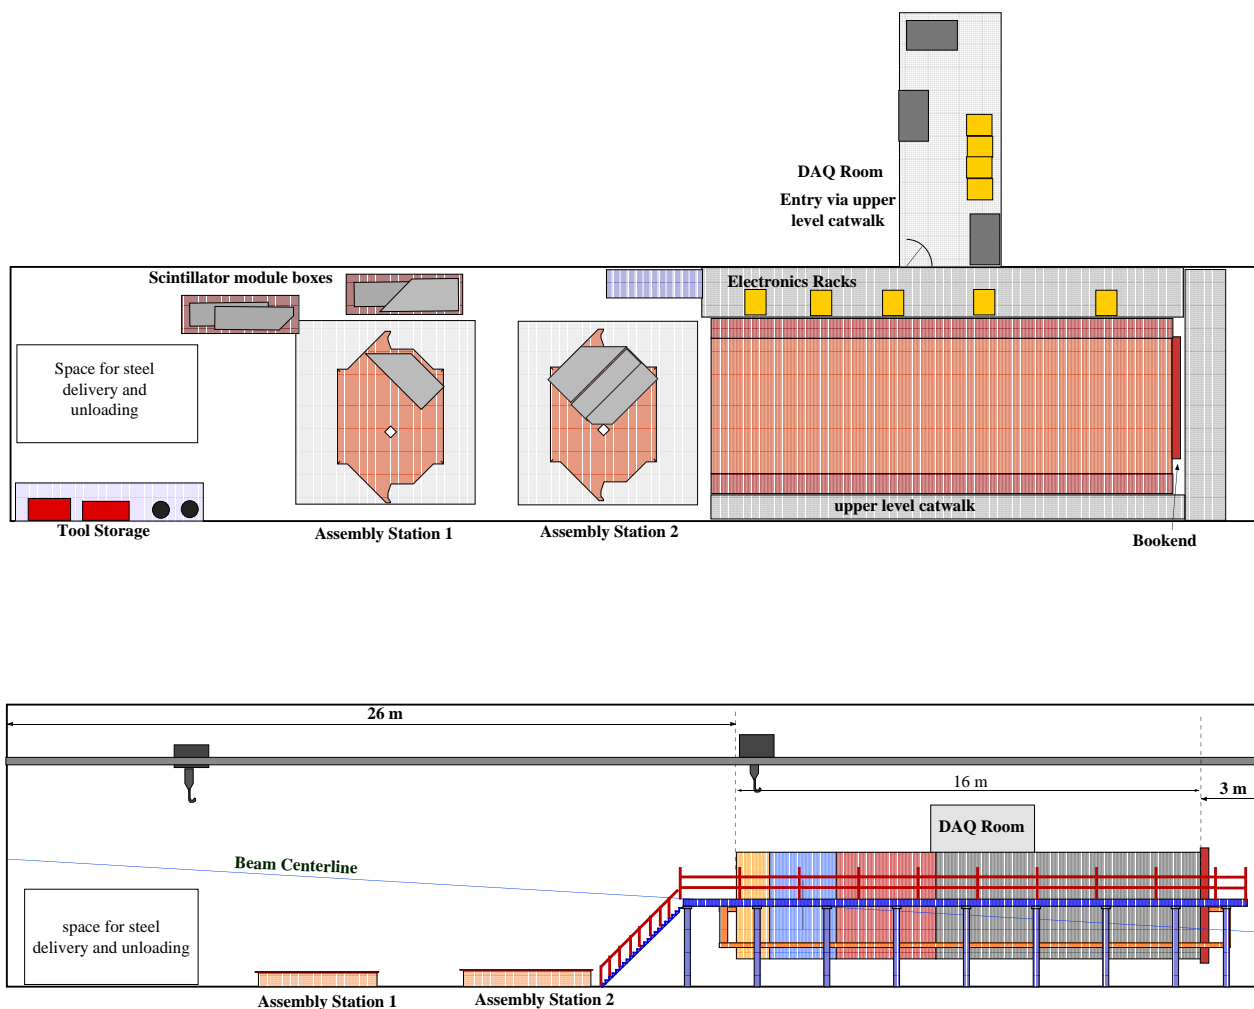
Sketches of the layout of MINOS near detector hall, showing the location of the assembly workstations and the size of the completed detector. The upper drawing is a plan view and the lower drawing is a side-elevation view of the facility.
